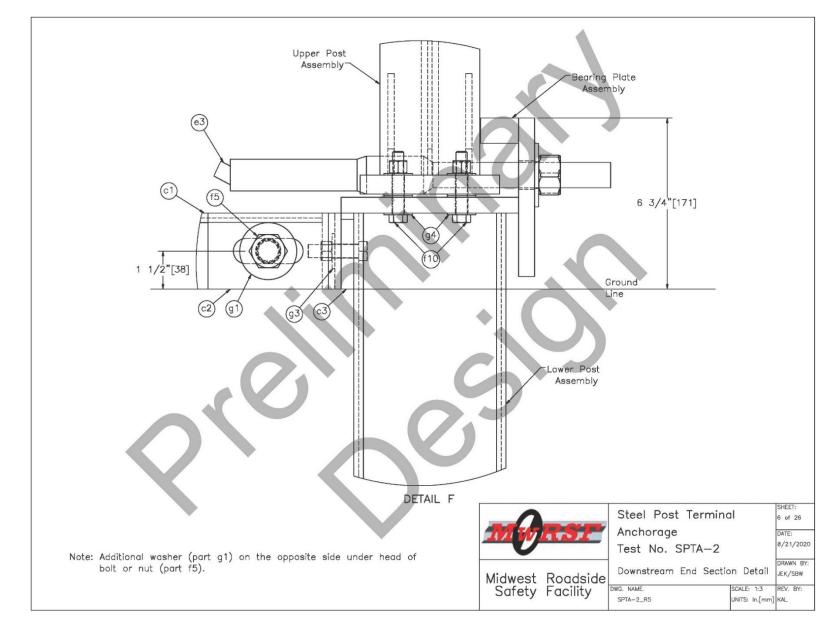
Downstream End Section Detail, Test No. SPTA-2
